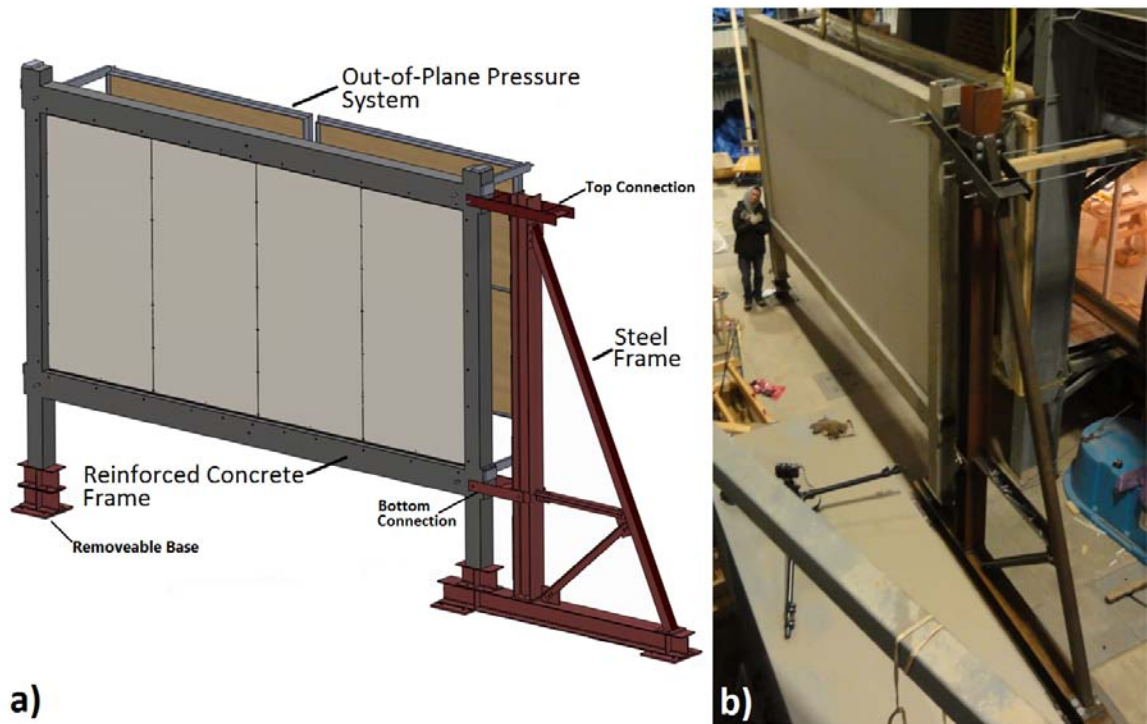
Final Test Apparatus: a) As Designed; b) As Constructed at IRLBH
